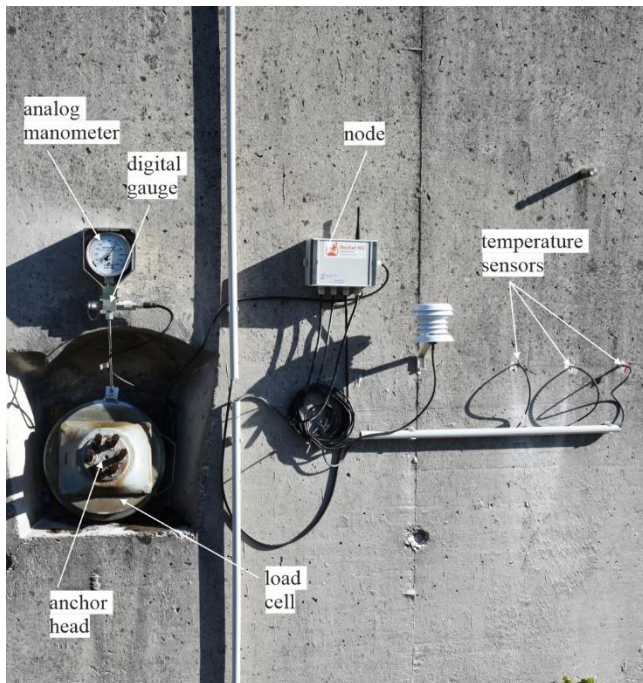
Anchor wall, anchor head and scheme of monitoring positions and sensors.
